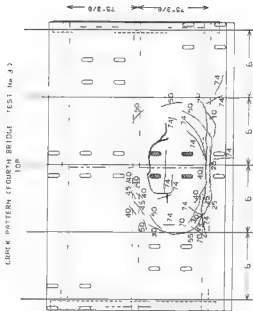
Top Cracking Pattern (Fourth Bridge - Test No 3)
